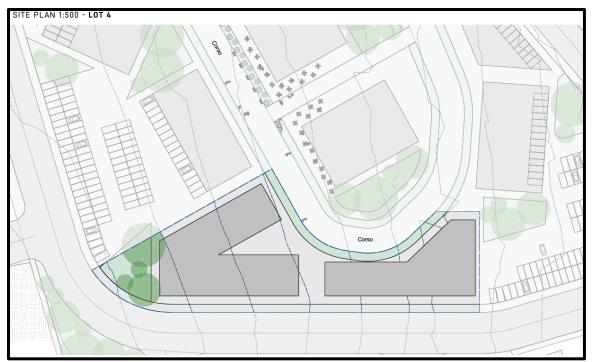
Lot 4 of the Mixed–Use Precincts Site Plan (Source: Robert Harwood Architects)
